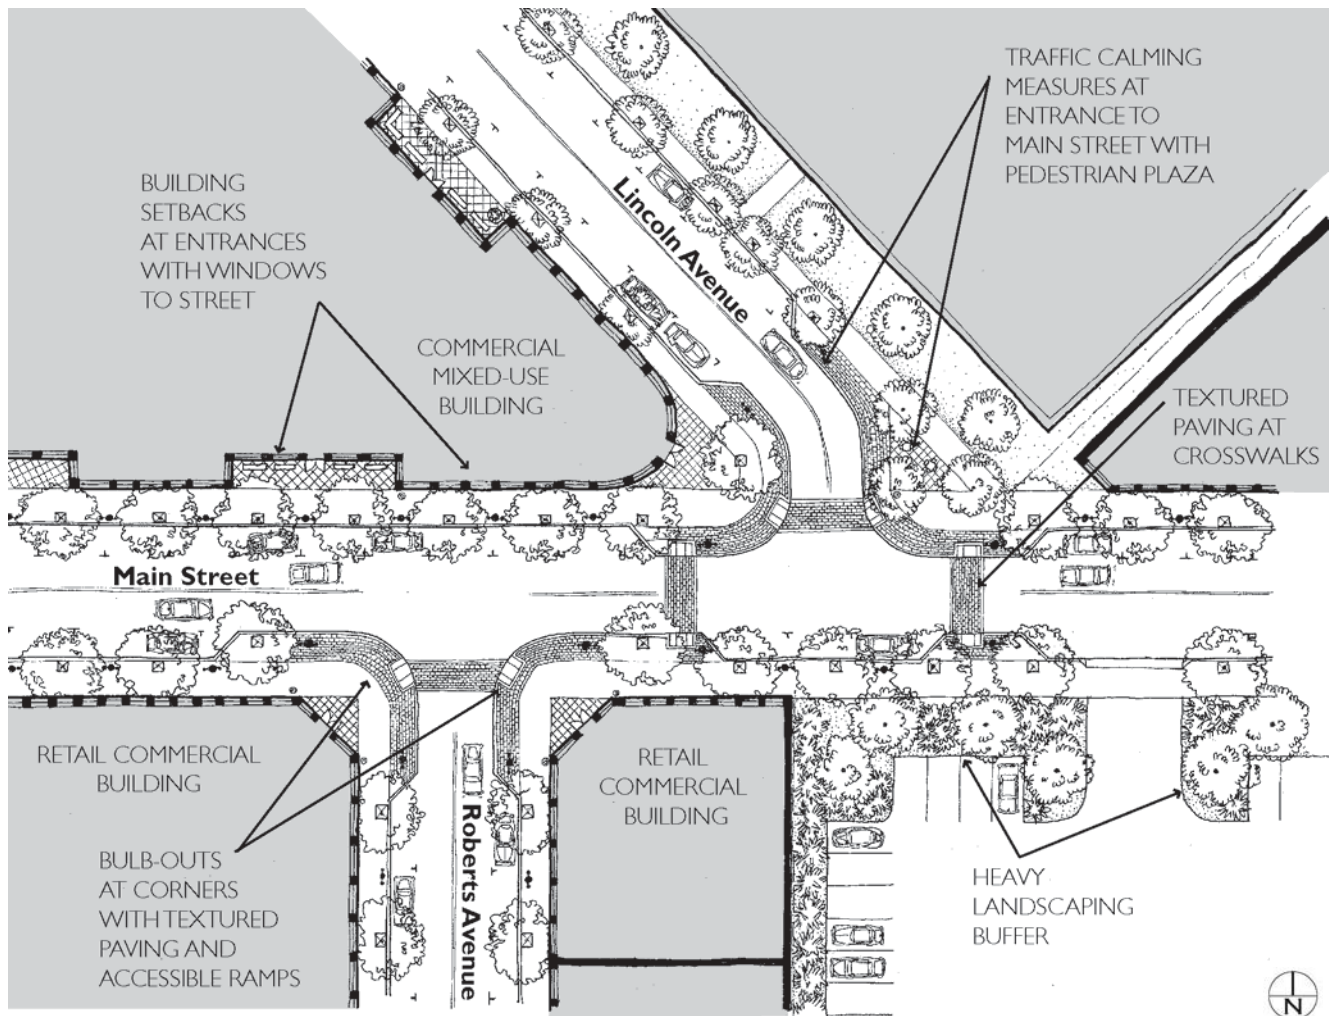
Long-Term Vision for Main Street Intersection at Roberts Avenue and Lincoln Avenue
